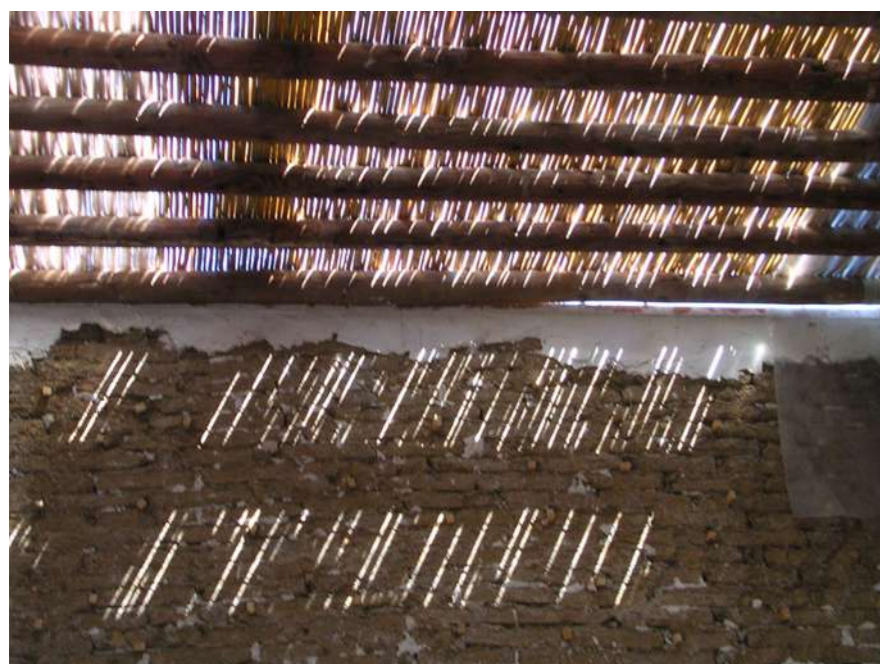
Reconstruction of the roof with treated existing timber beams and reed-work. © Y. Hadjichristou
